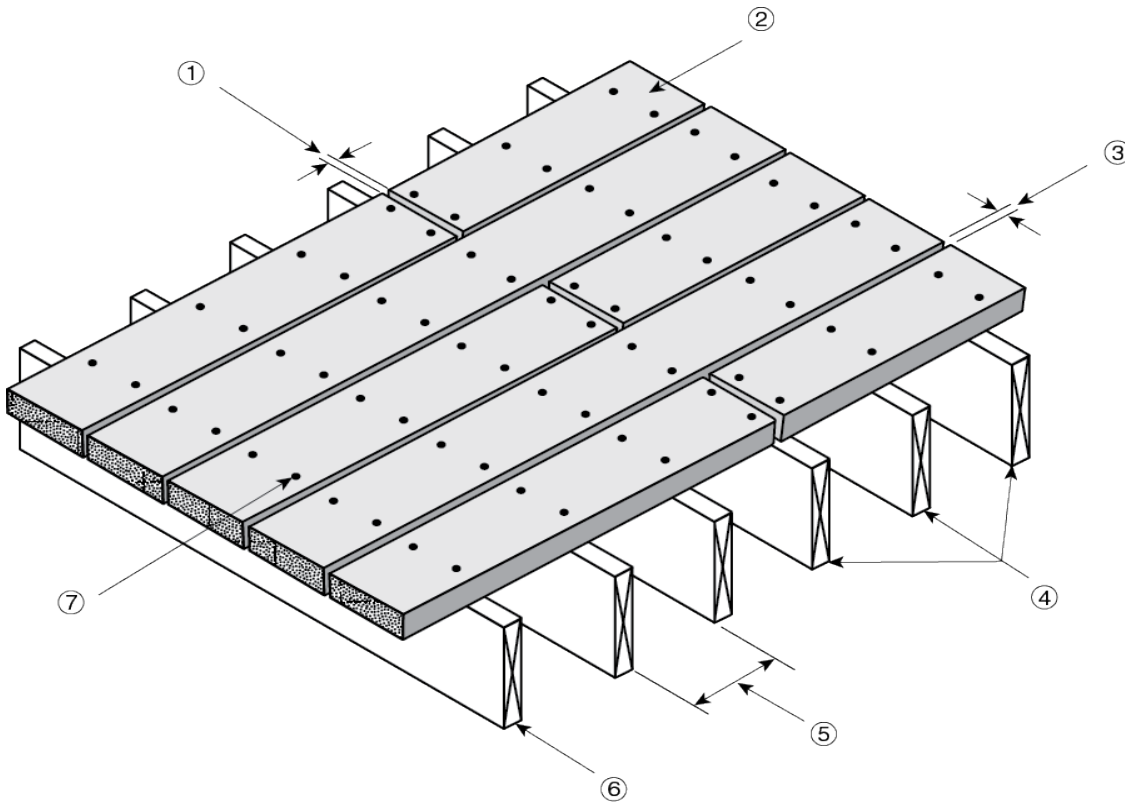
Installation details for “Inteplast Deck” and “Wolf Serenity Deck”, solid profile
